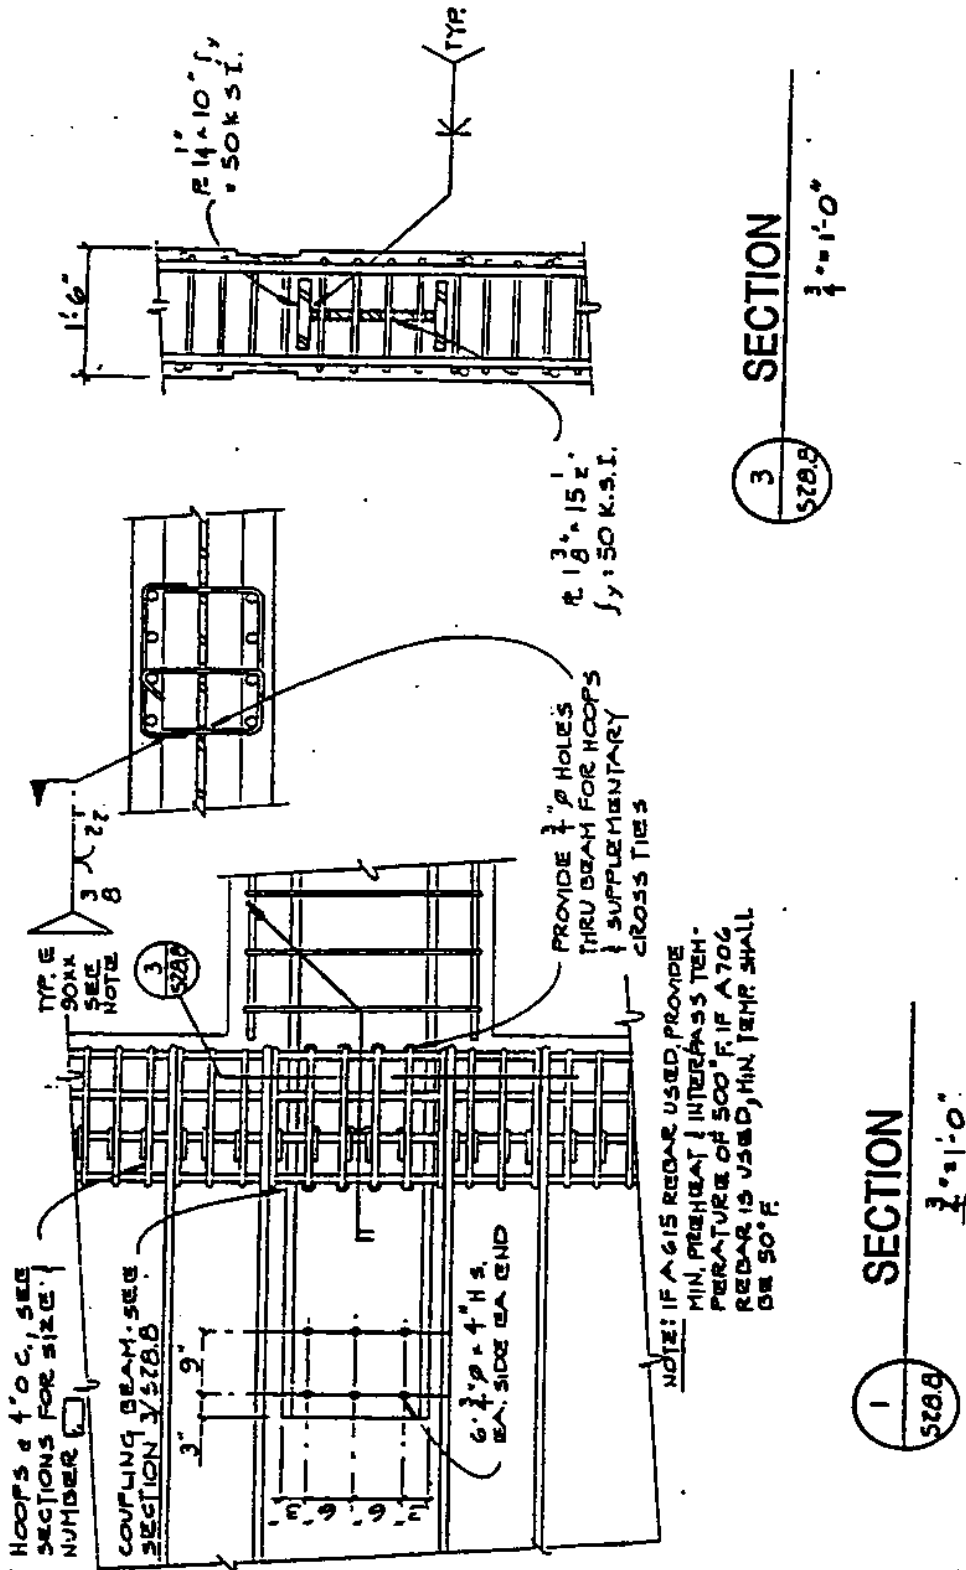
A Typical Steel Coupling Beam RC Wall Connection for Mid-Rise Buildings (Courtesy of Kramer Gehlen Associates Inc. (Gong and Shahrooz, 1998)) Associates Inc.
